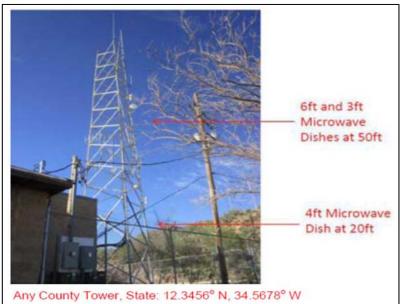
Ground-level photograph showing proposed locations of new communications equipment on an existing tower.
